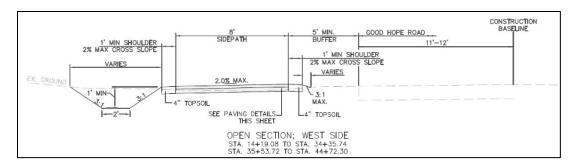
Proposed Typical Cross Section – West Side with Buffer
